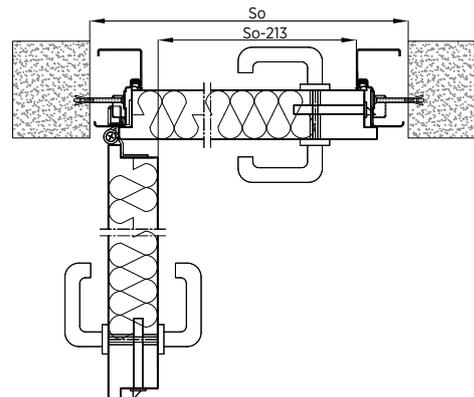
Installation of the ECO Tech single-leaf seamless door with an internal frame without a thermal break to a masonry wall - horizontal cross-section
